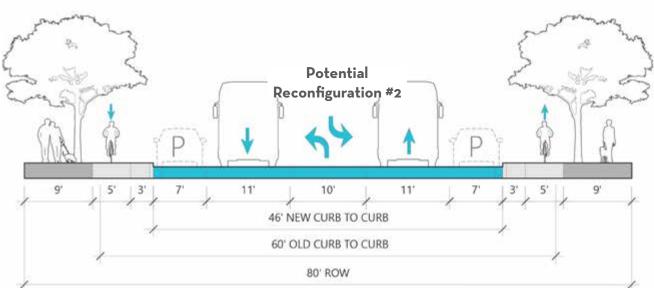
Potential Reconfiguration #2: One-Way, Sidewalk-Level, Class IV Bikeway on a Downtown Collector Street.
